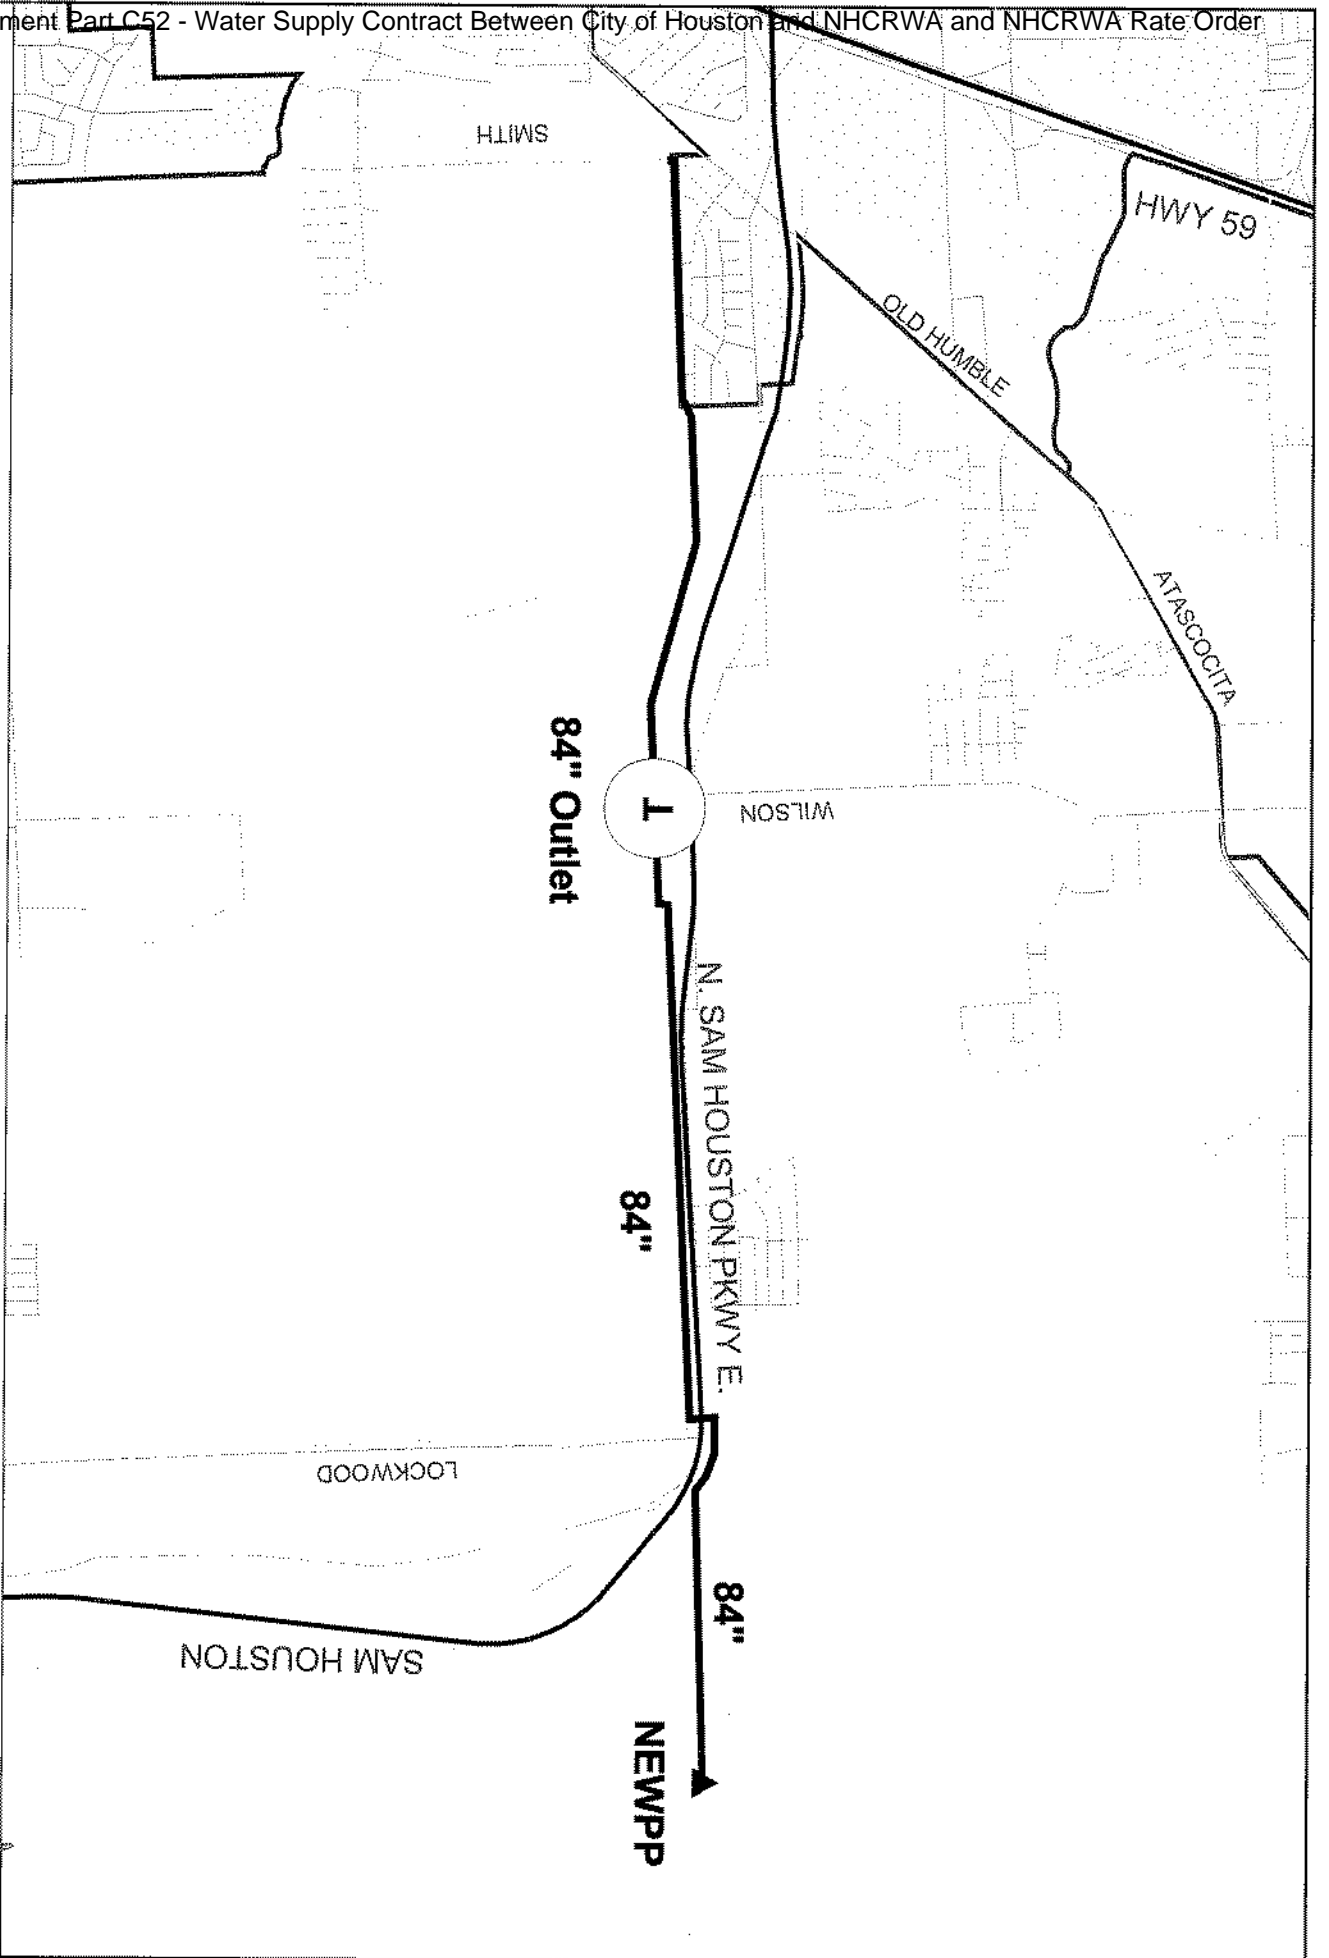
# EXHIBIT B : PLANT FACILITIES - NORTHEAST WATER PURIFICATION PLANT
